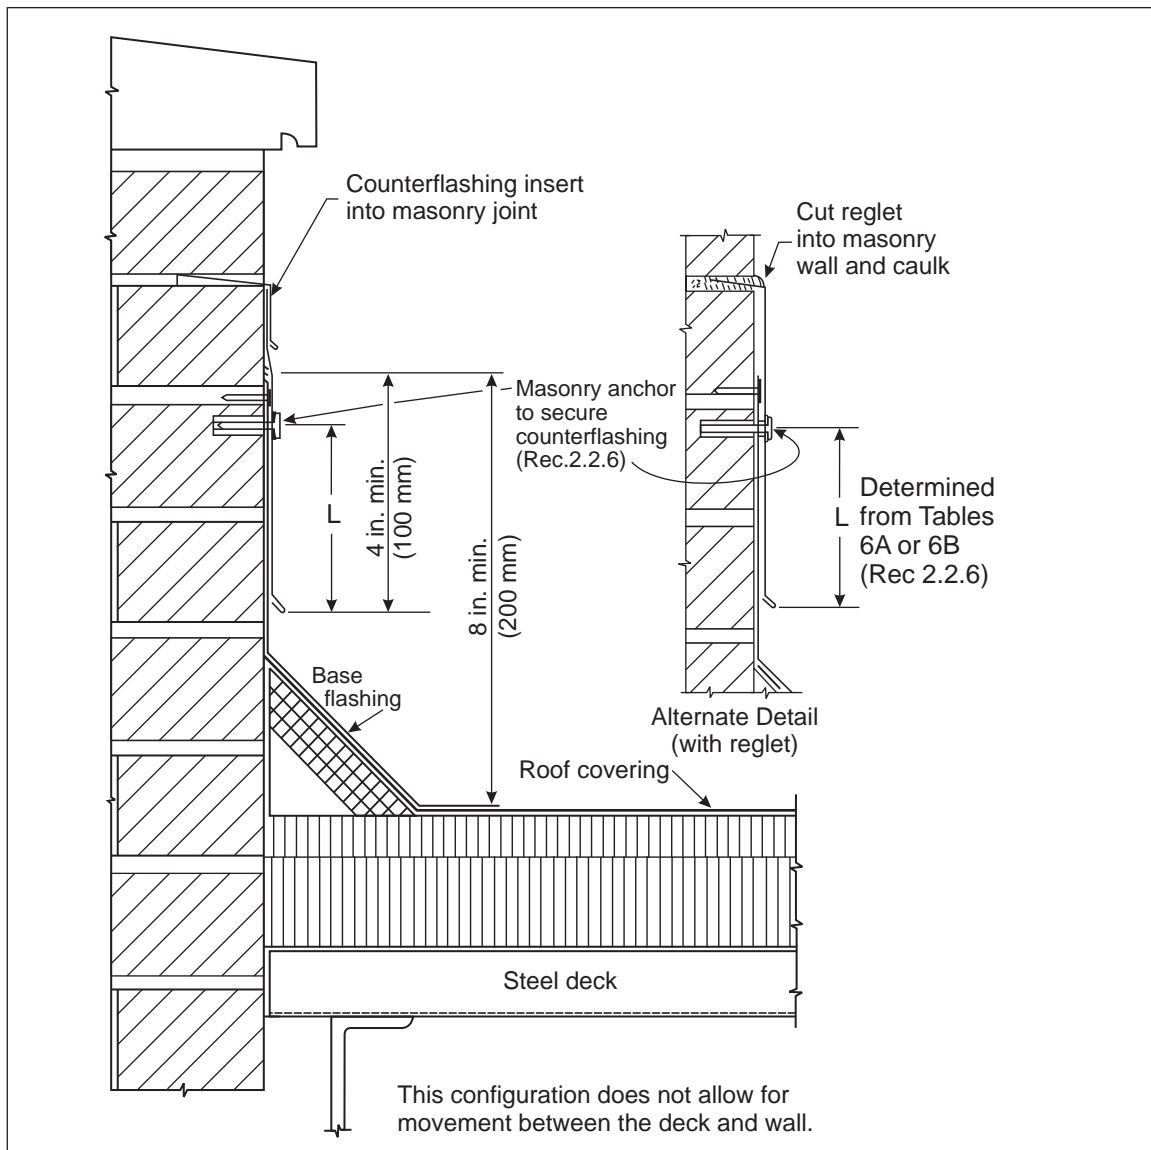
Multi-ply roof cover with masonry wall with high parapet
